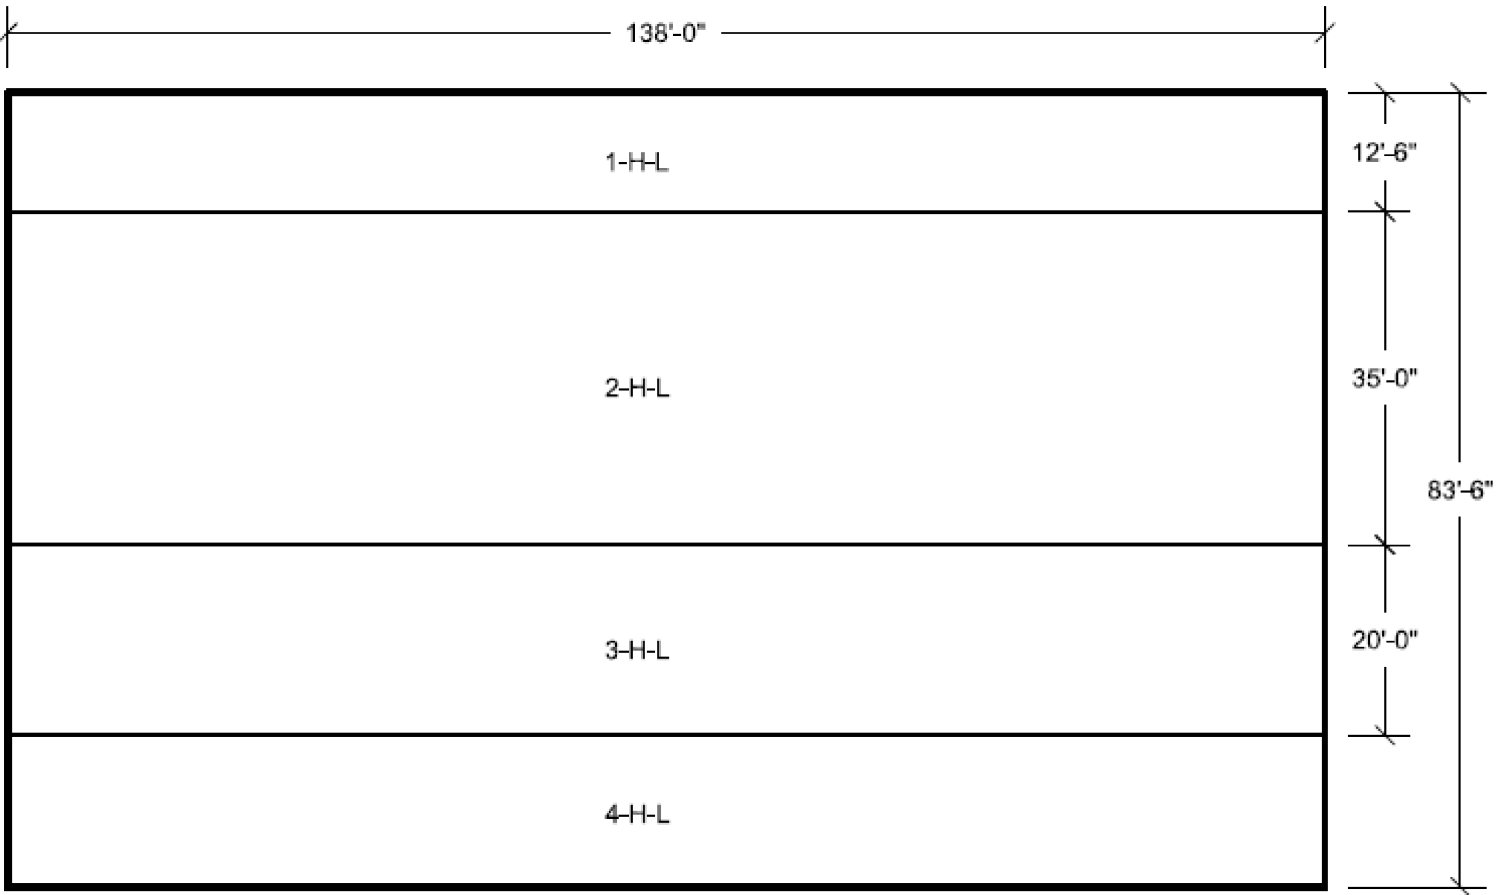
H.6-92 UHS Basin East Wall Looking West Horizontal Reinforcement Zones Near Side Face
